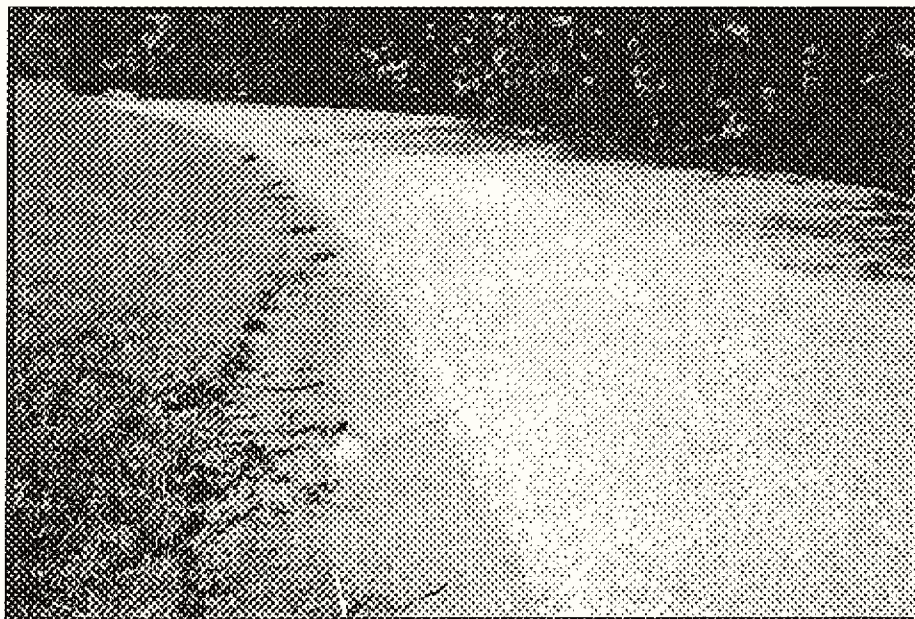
MP 0.70 Typical pavement section with drainage features
